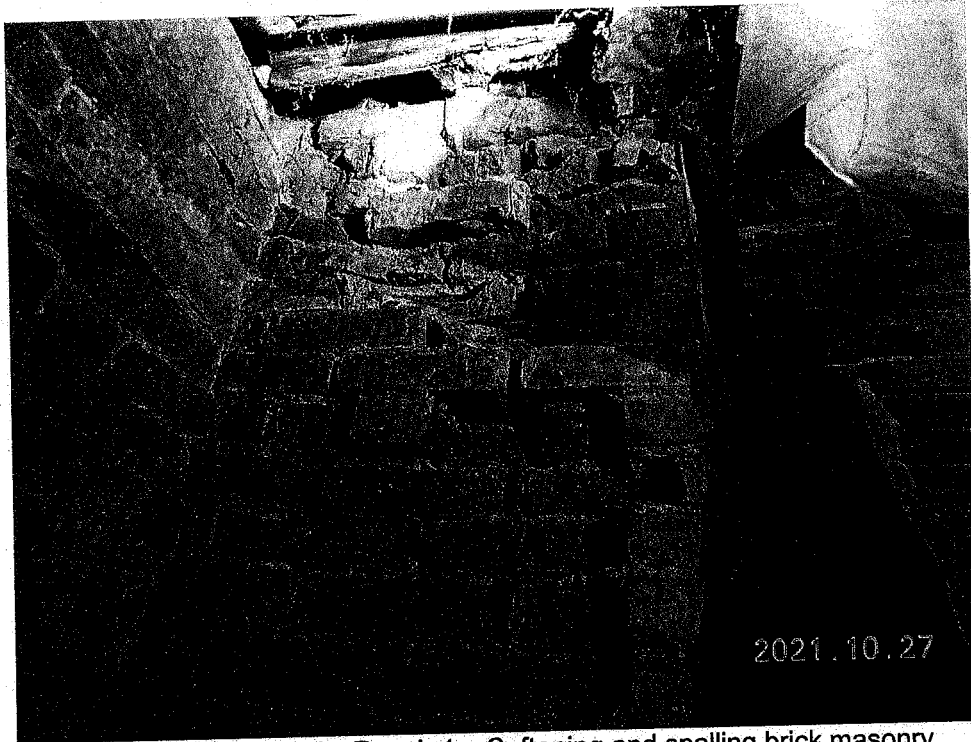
Priority Repair 1 – Softening and spalling brick masonry foundation with deteriorated mortar joints – Lower Level, Grid A/2-7
